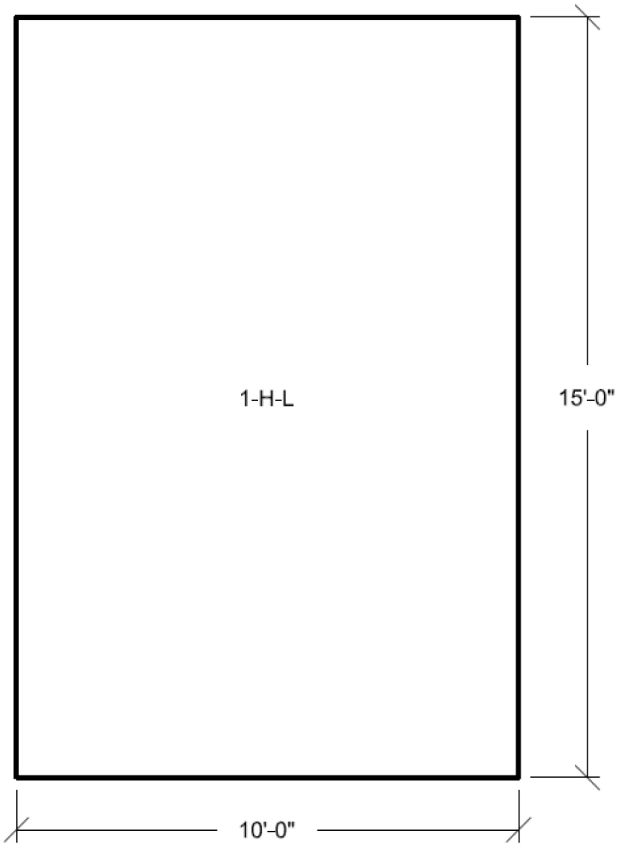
H.6-206 DGFOV Wall 16 Looking From Outside
